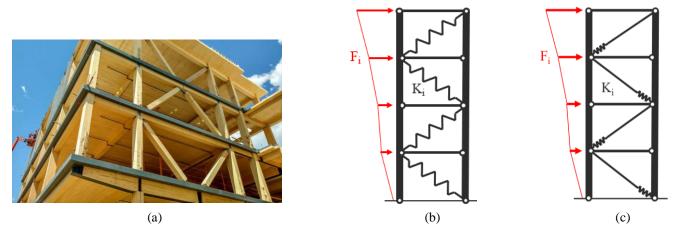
(a)A braced frame building under construction, and schematic diagram of FE model for a 4-storey braced frame with an equivalent element for (b) each diagonal brace assembly or (c) two end connections.
